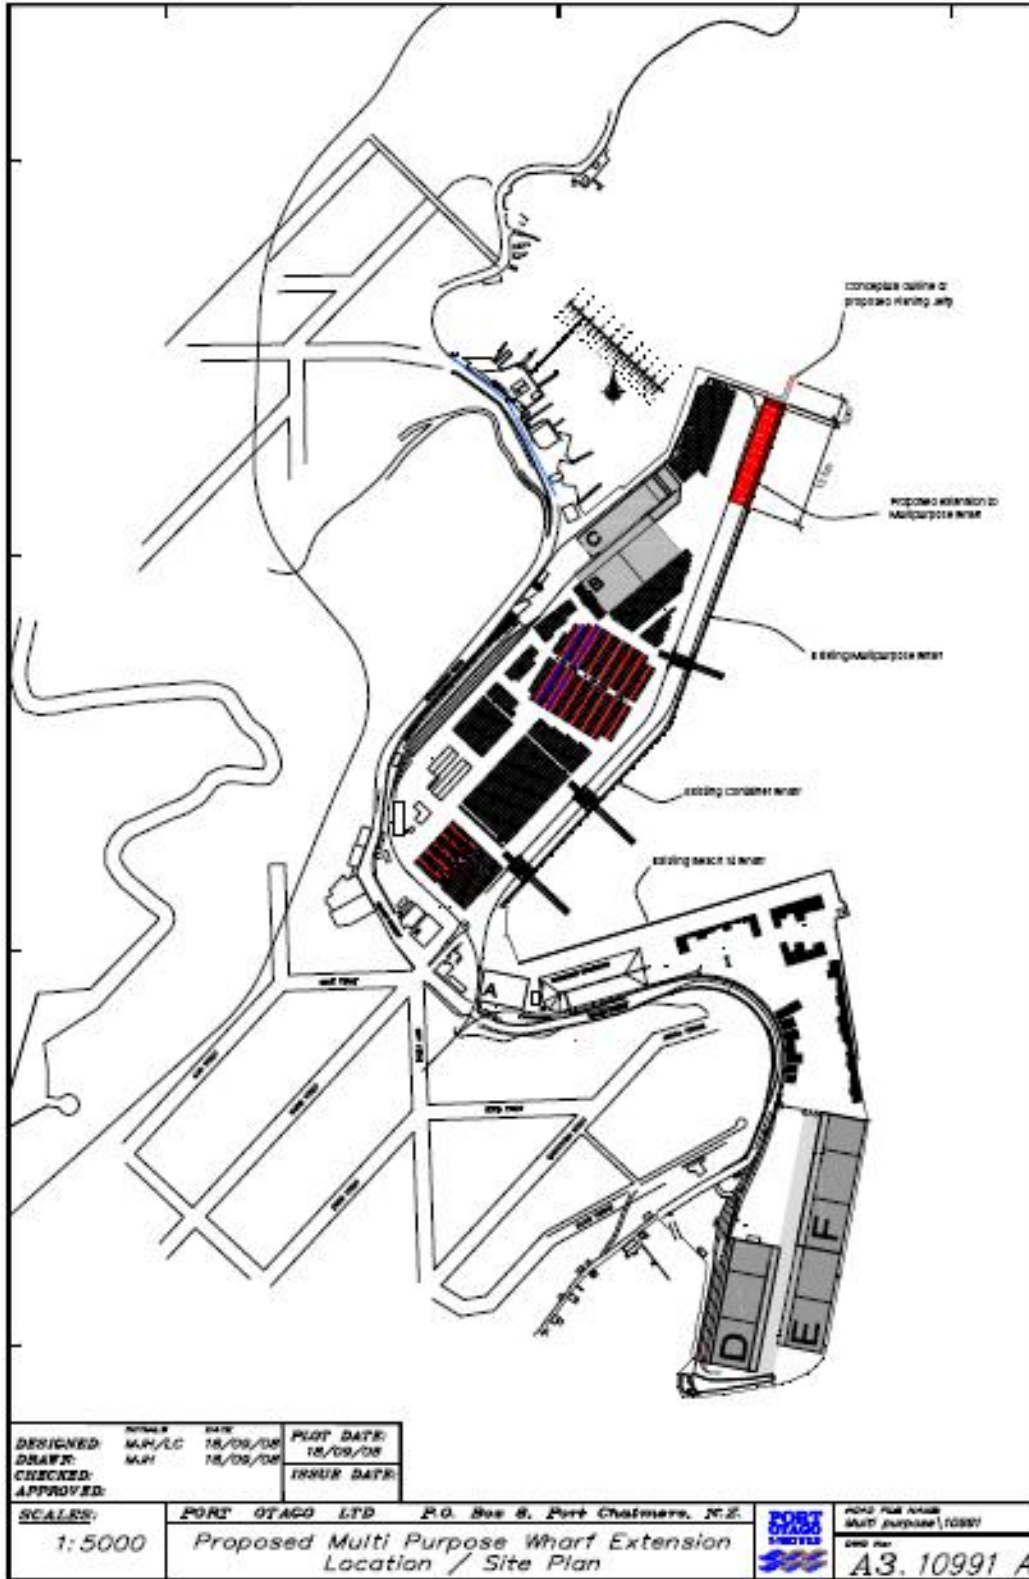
Proposed Multi Purpose Wharf Extension – Location / Site Plan
